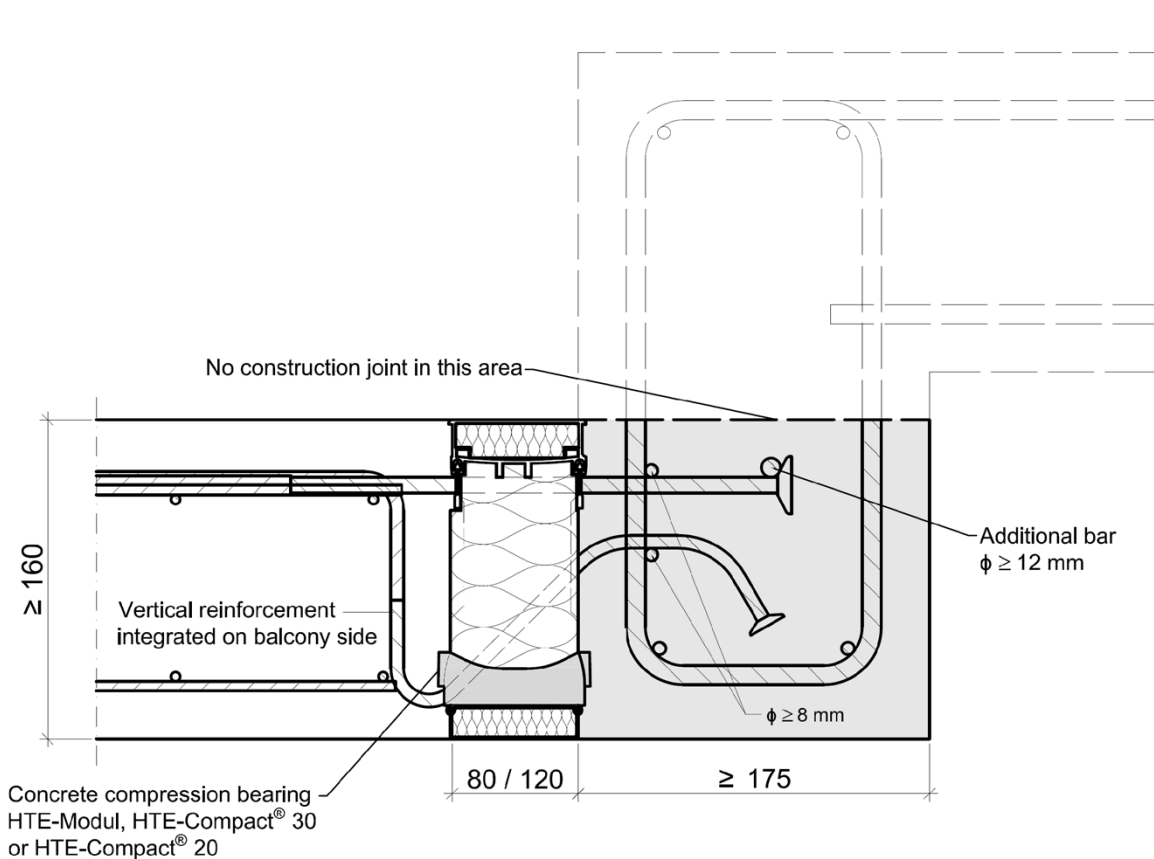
Example of Schöck Isokorb® Type K-U with CCE in installed condition with connection to wall or height offset
